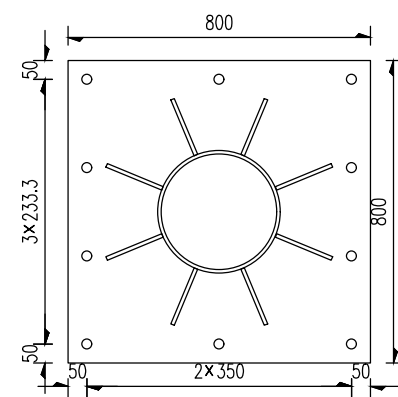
DETAILDE DRAWING OF FOUNDATION MAIN REINFORCEMENT
